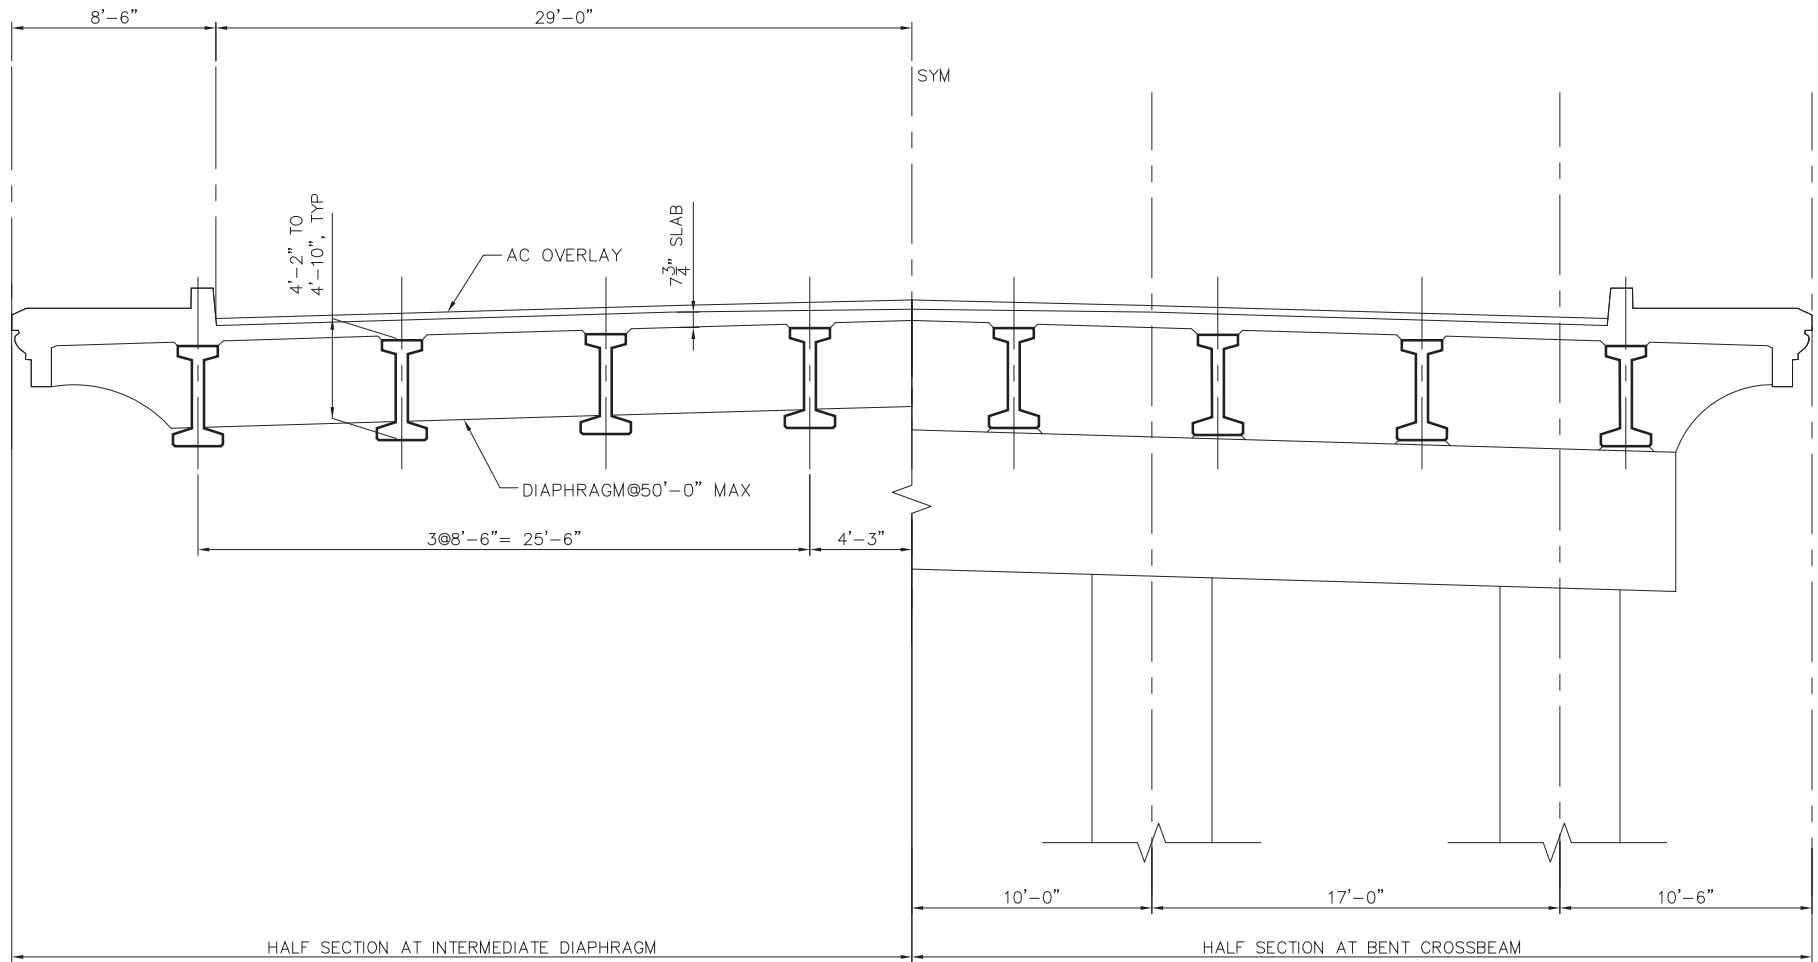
PRECAST CONCRETE I-GIRDER DECK SECTION
